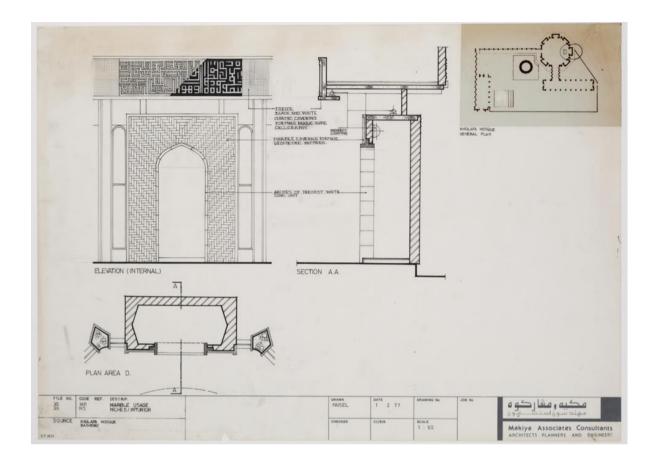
Southeast interior of the dome support wall, arched niche, ceramic frieze and section A-A with materials description, plan area D and location on small general plan. Original drawing. Source: (Aga Khan Documentation Center at MIT; Mohamed Makiya Archive, 1977).
